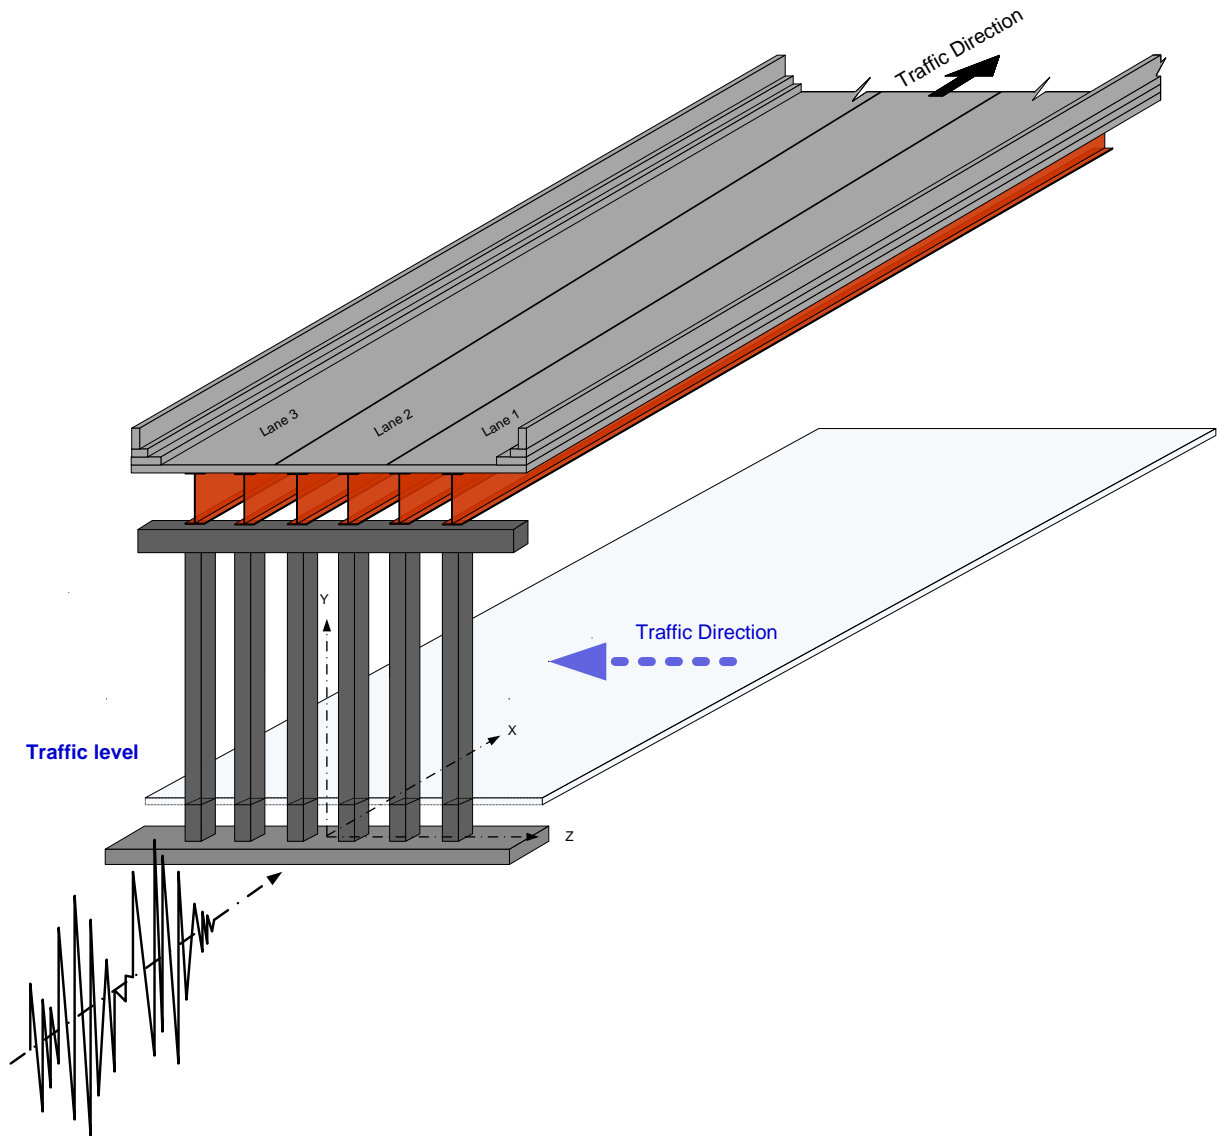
Slab-on-girder bridge with traffic configuration and under seismic load.
